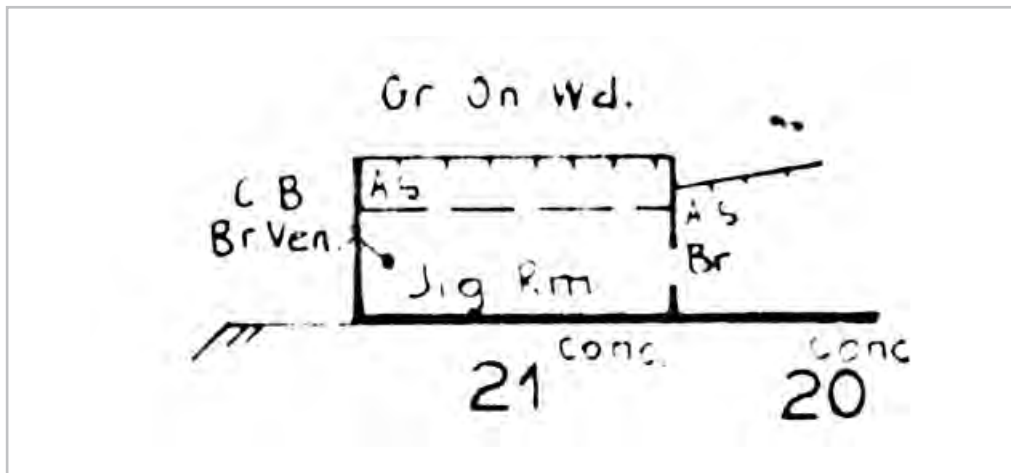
Factory Mutual Insurance Co. *Mill Realty Co.* 1965. Southeast-northwest cross-section through Buildings 21 and 20. Scale: 1 inch= 10 feet (approximately).
